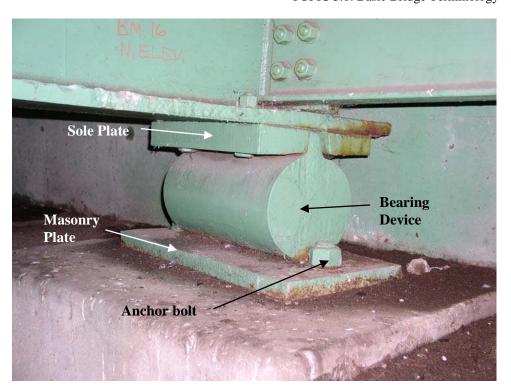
Steel Roller Bearing Showing Four Basic Elements
